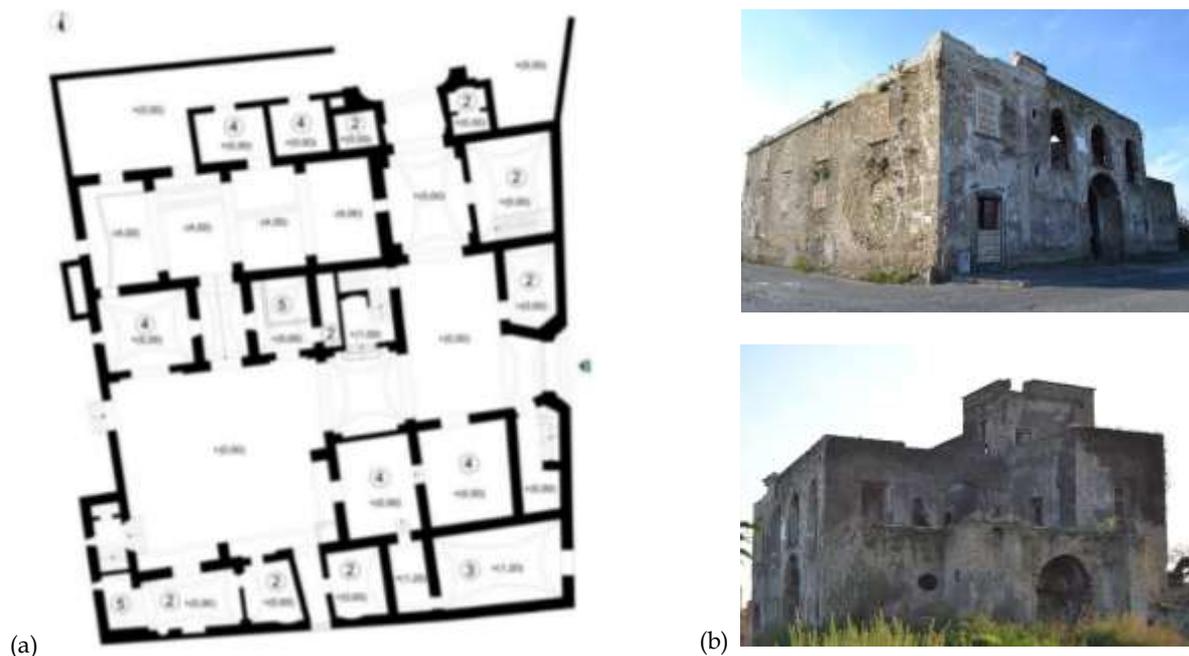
Ground floor layout (a) and external views (b) of the Rossi farm
